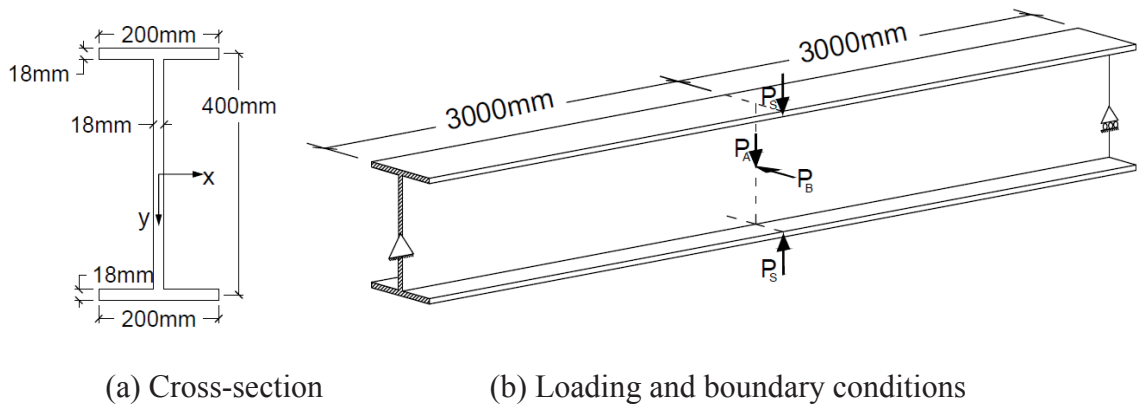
Layout of the simply-supported beam under mid-span point load
